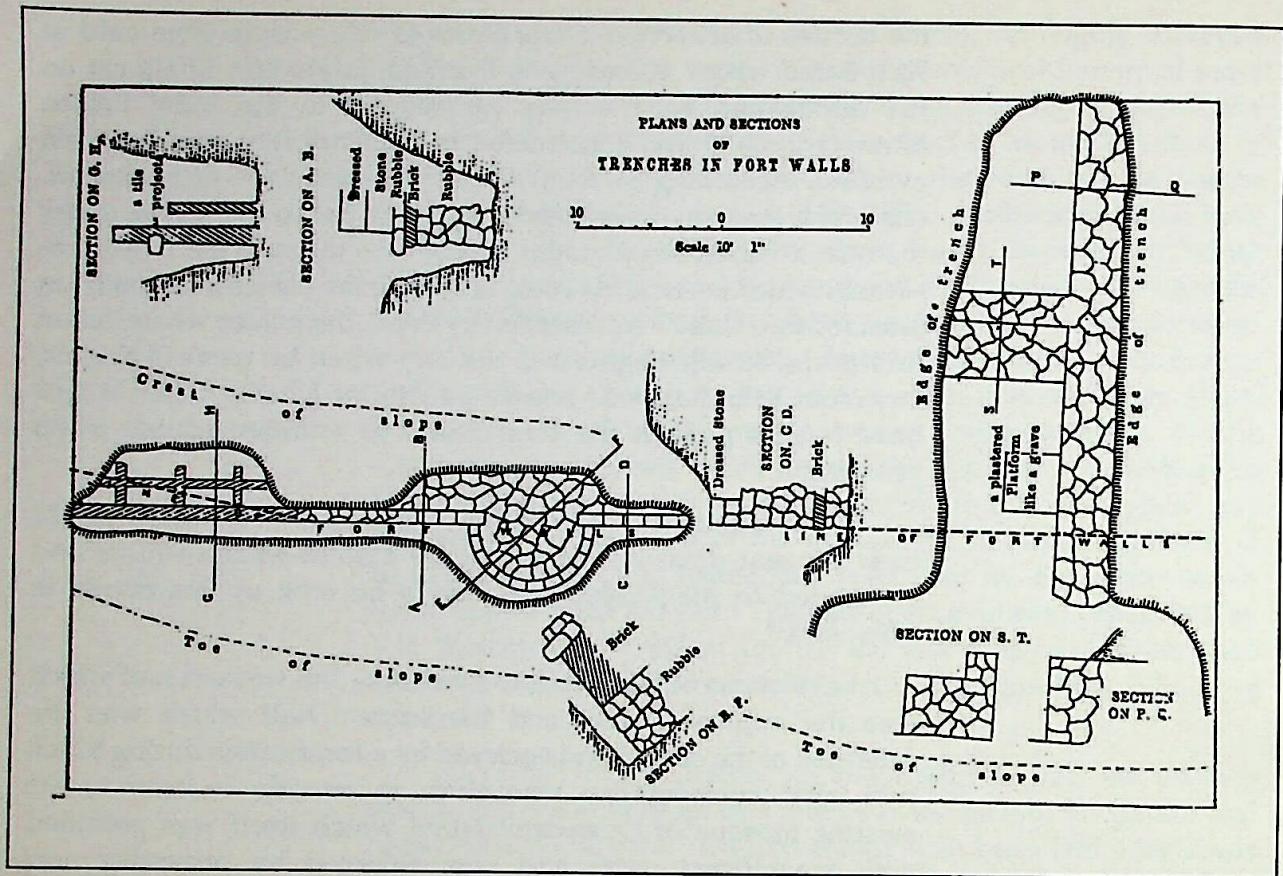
Plans and section of trenches in fort walls (Lal Kot)
